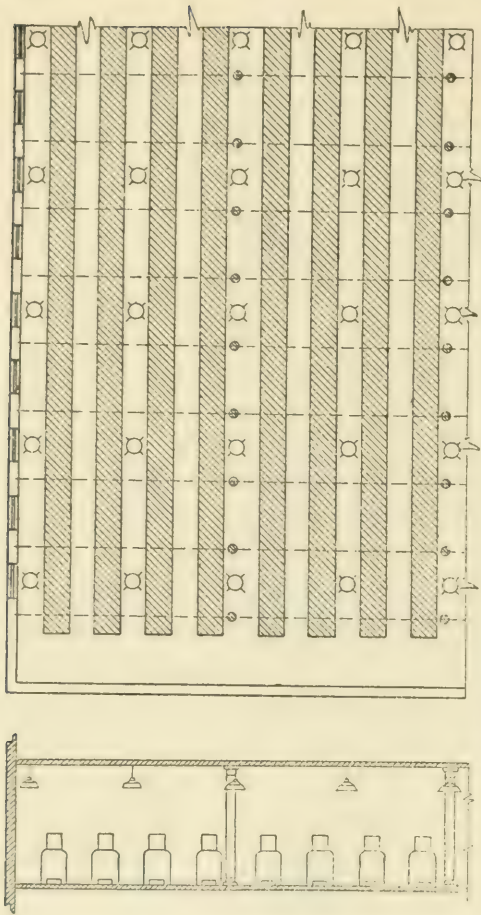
One spacing arrangement easily adapted to the lighting in a spinning room.
